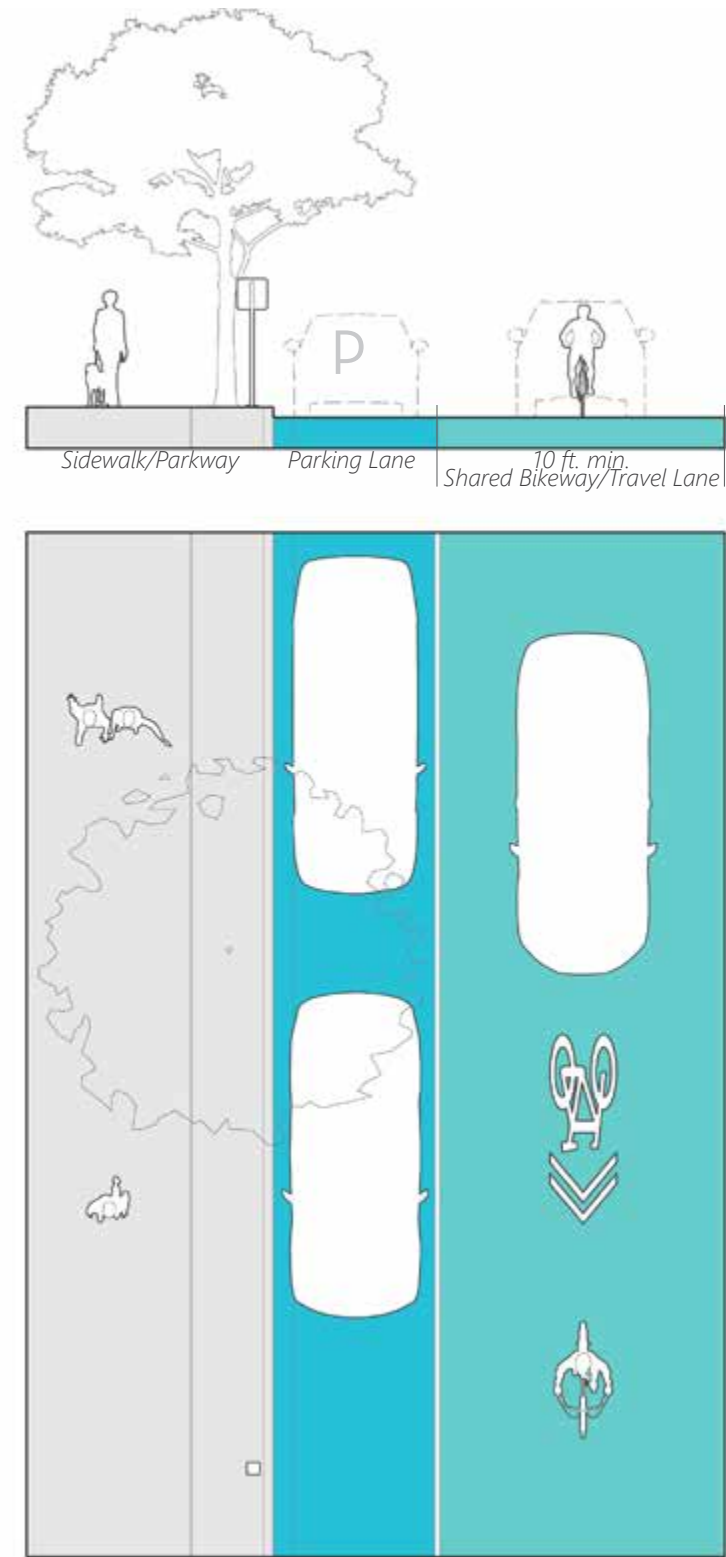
Typical Class III Bikeway, On-Street Parking Adjacent, with Shared-Lane Pavement Marking.
